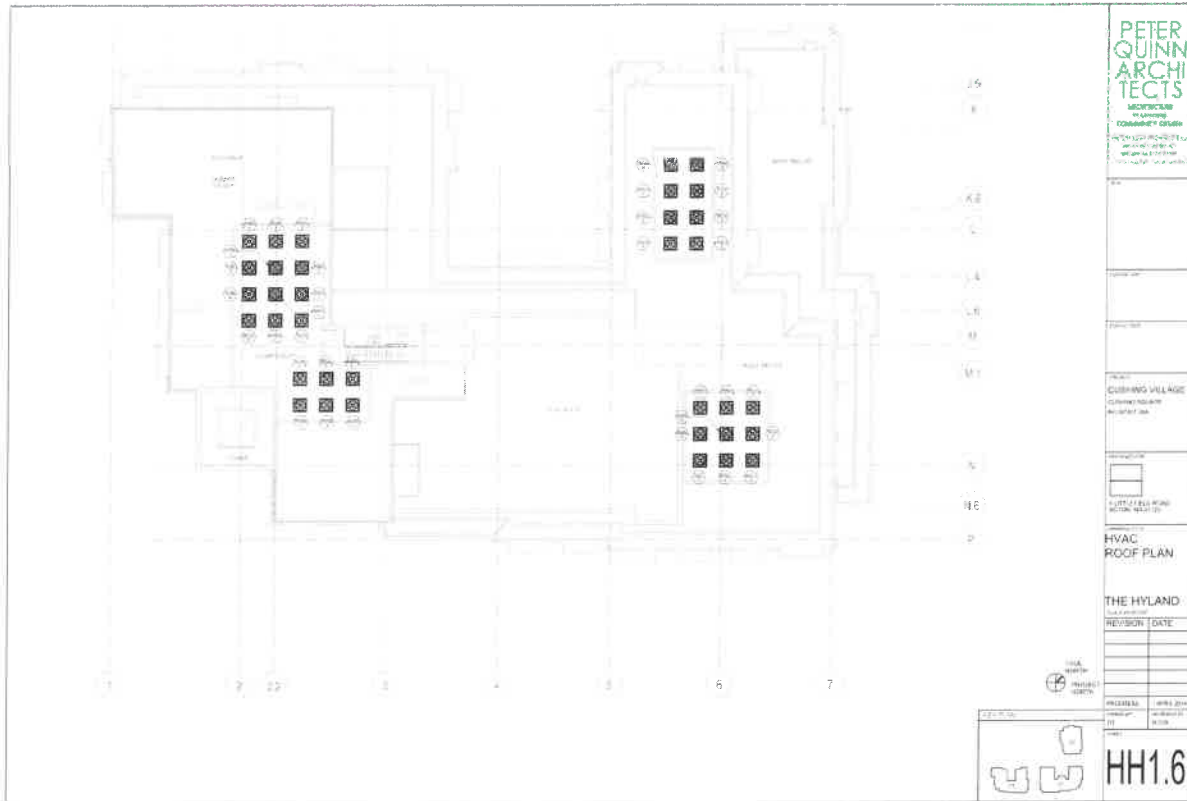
Hyland Building roof plan showing residential compressor/condenser units
